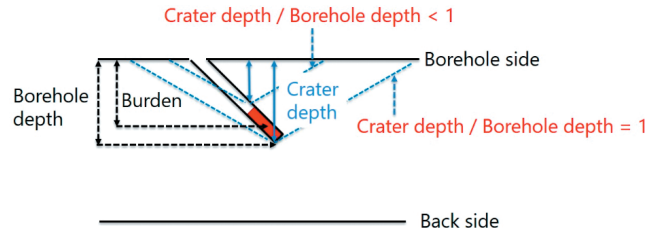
Schematic view indicating the fracture performances for Type A fracture.
